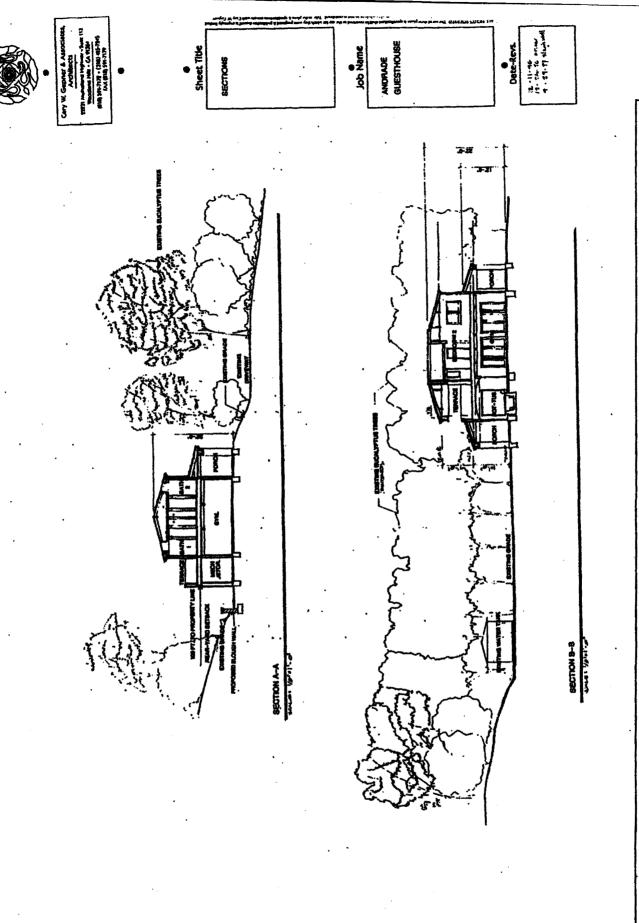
(4-97-084) Elevations for Proposed Project
